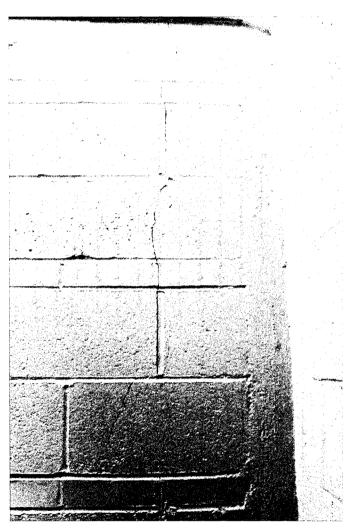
Weinbach Booster Station Concrete Block Crack
